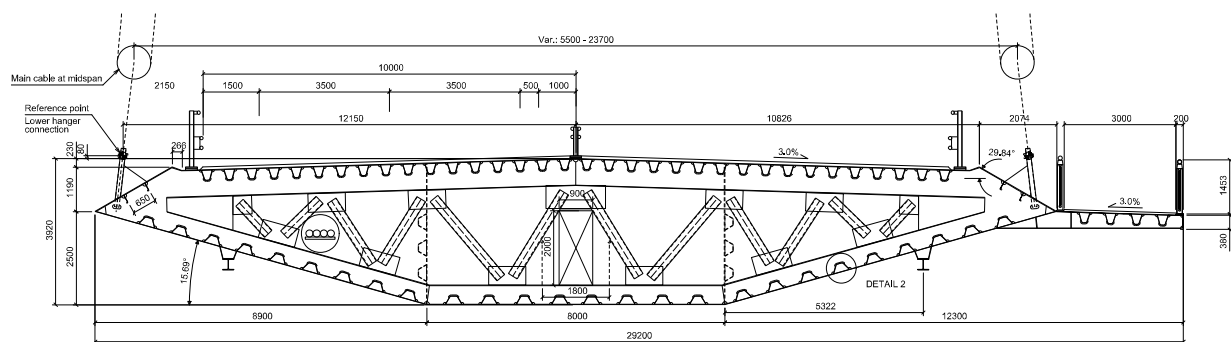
Cross-section of the girder, (NPRA, 2016c)
